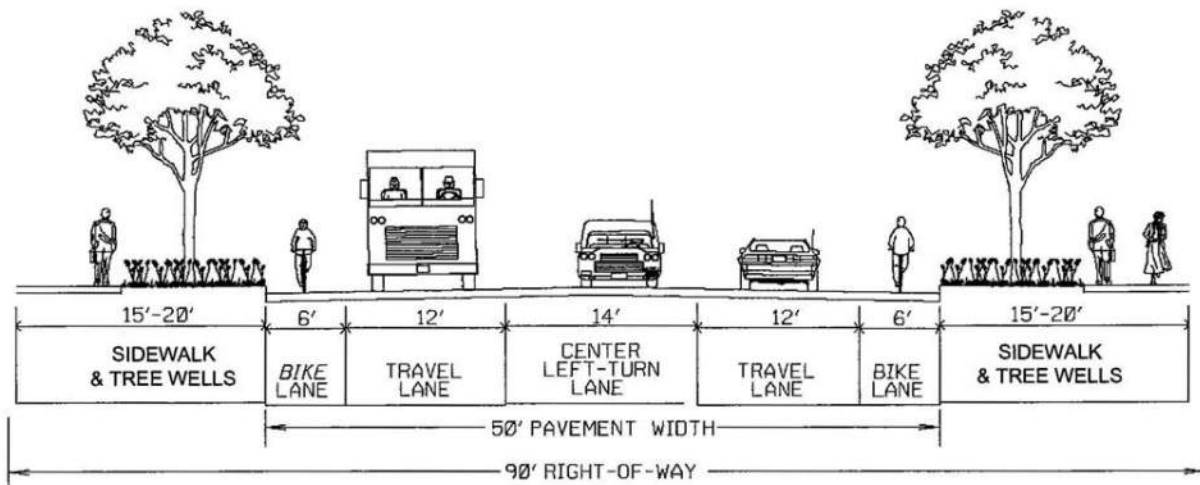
Existing Cross-section Standards for Arterial/State Roadways.
